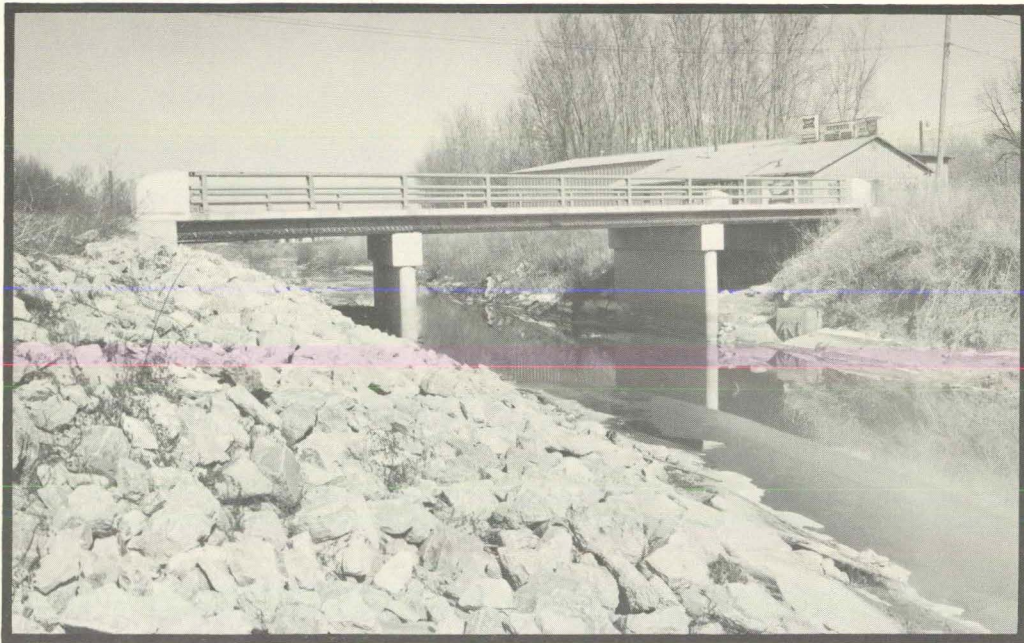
Looking upstream at Fifth Street bridge over Mad Creek at Muscatine, Iowa, Sta. 31+00.
